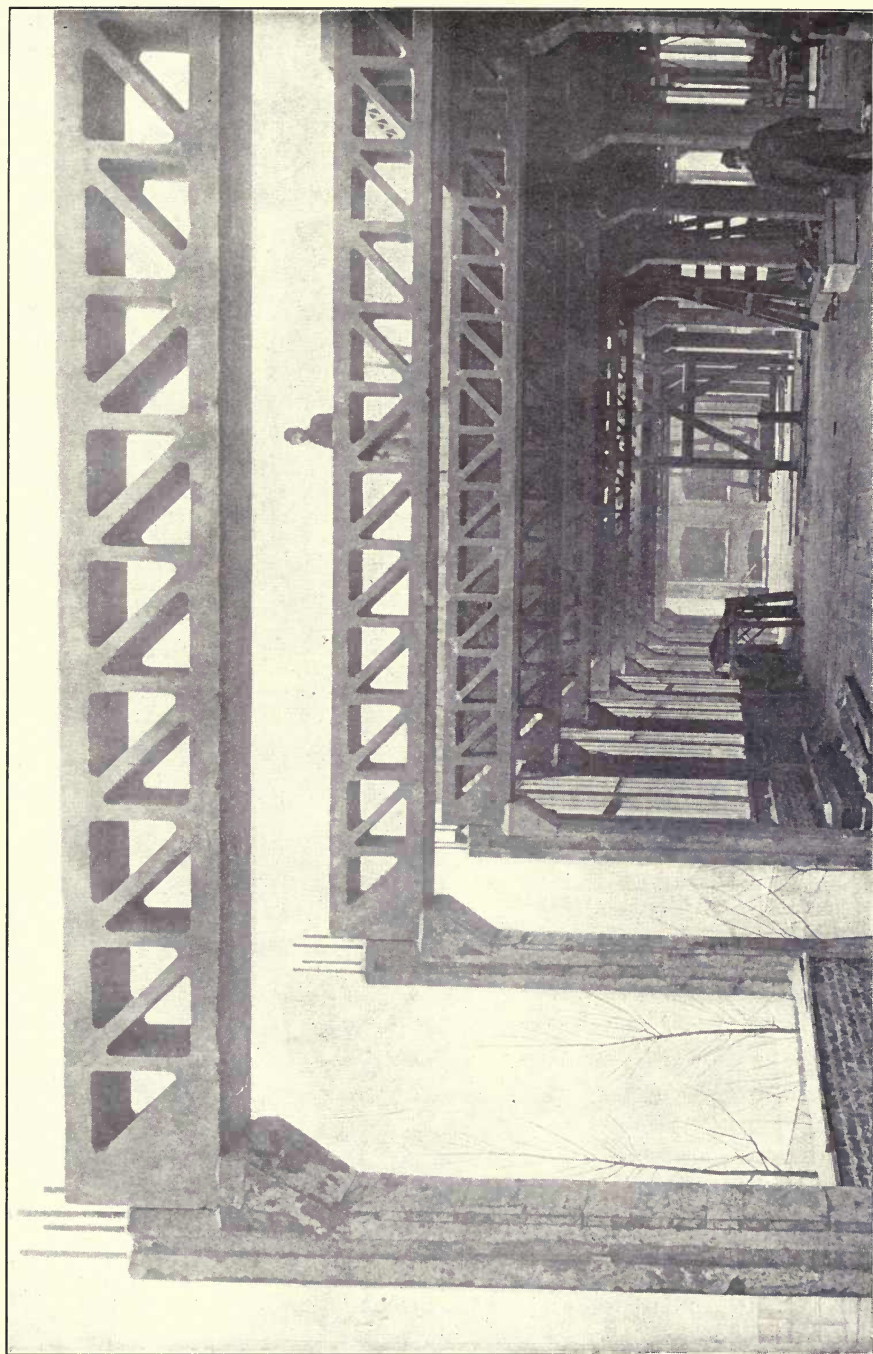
View of Visintini Columns and Girders in Textile Machine Shop. (See p. 151.)
